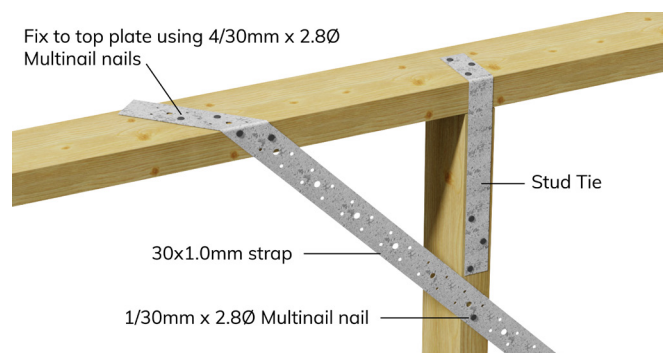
Nails to top plate - for 3.0kN/m bracing wall
